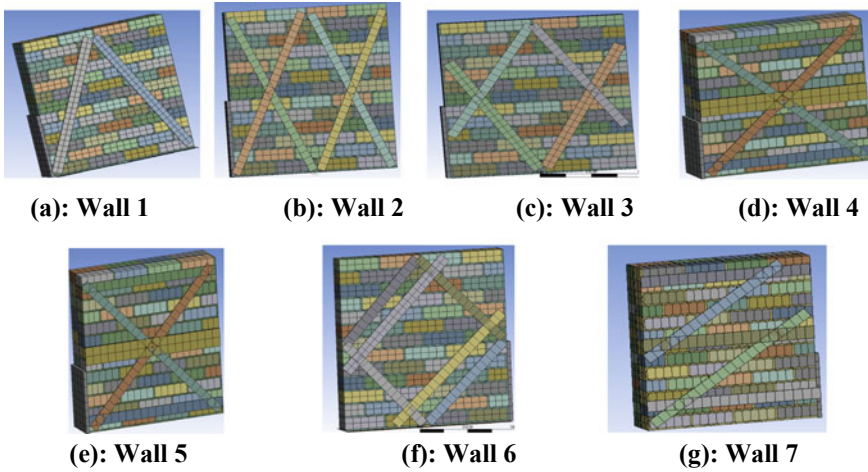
Layout of CFRP strips for masonry walls of Set 1
